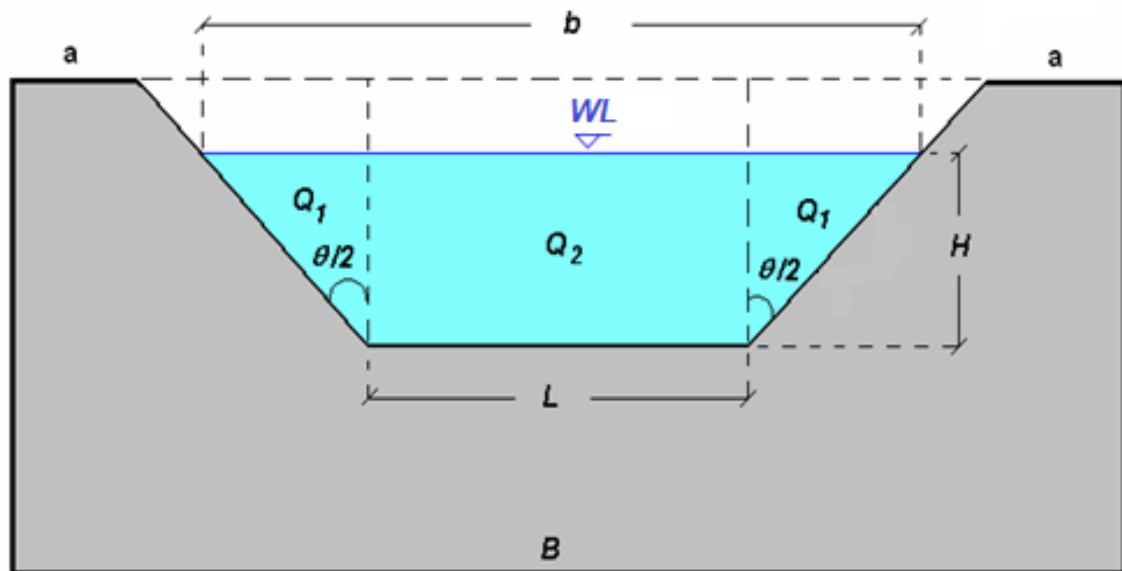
Trapezoidal spillway (Queiroz, 2017).
